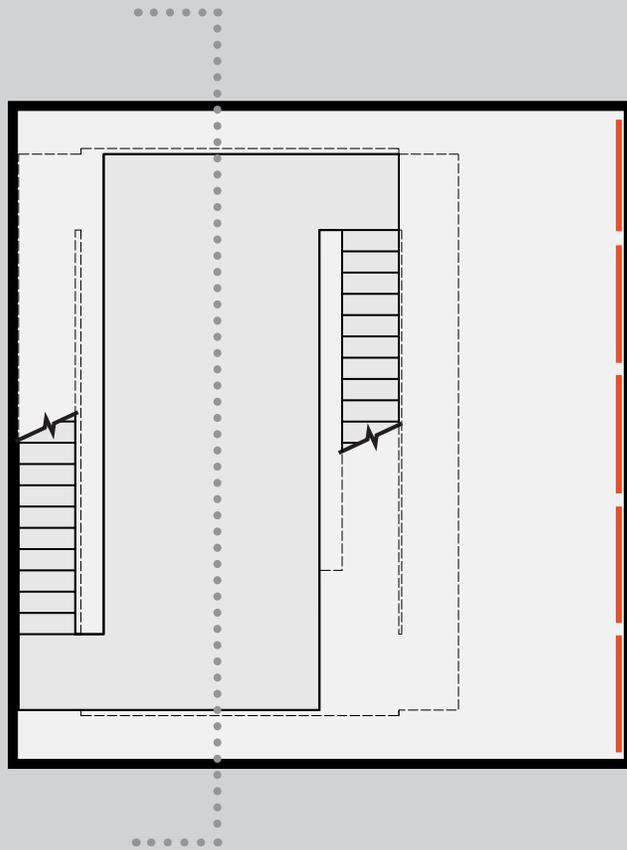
Floor plan of TEETERING TOWER installation space.
